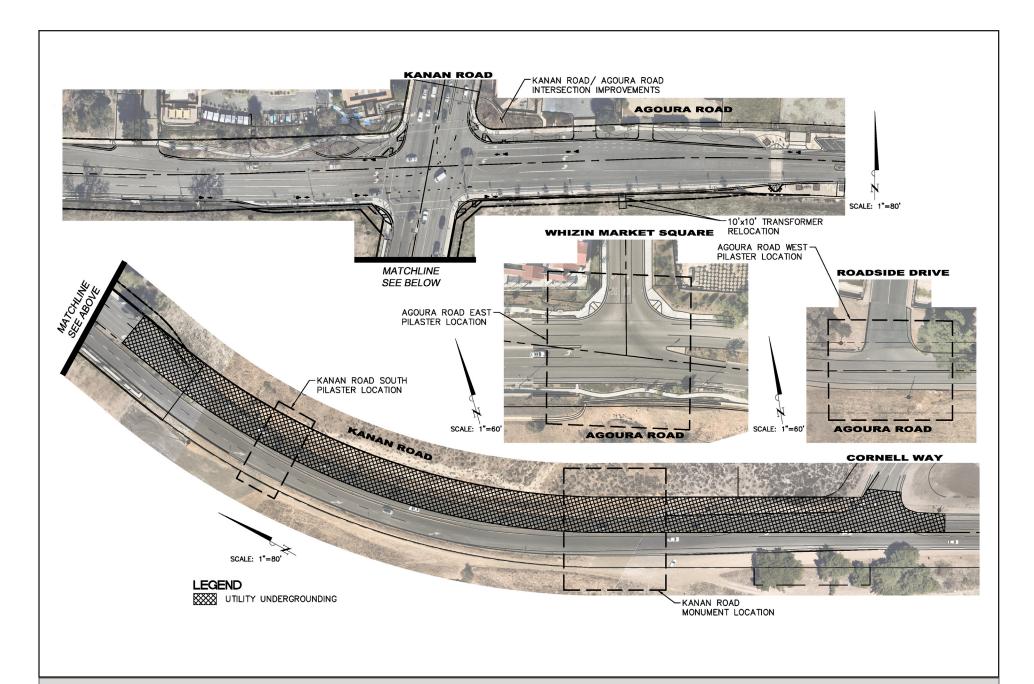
B: PROPOSED KANAN ROAD/AGOURA ROAD INTERSECTION IMPROVEMENTS
